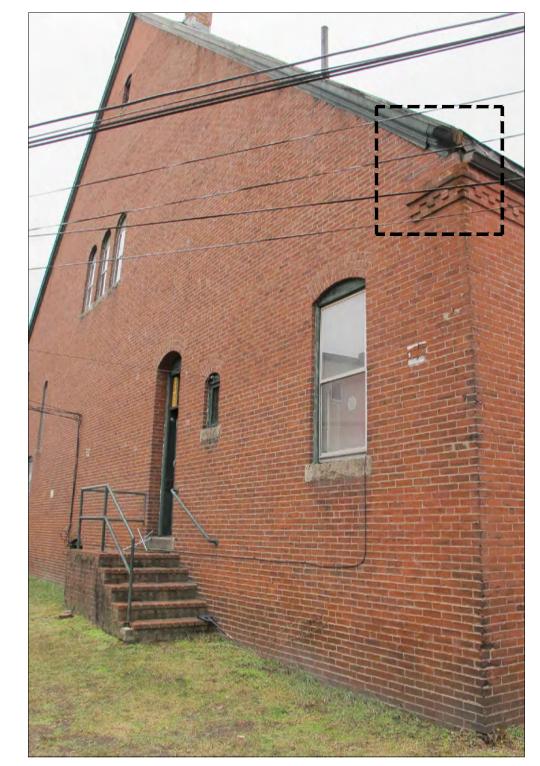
/DRAWING D-201: Missing roof rake return at west elevation, (right hand side).
